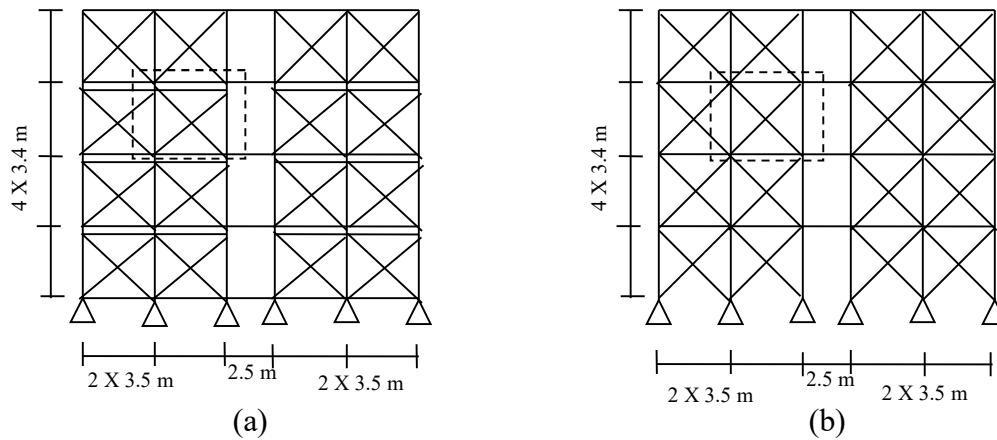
Four-storey braced frames for design of test specimens (a) MSB frame (b) Regular frame
